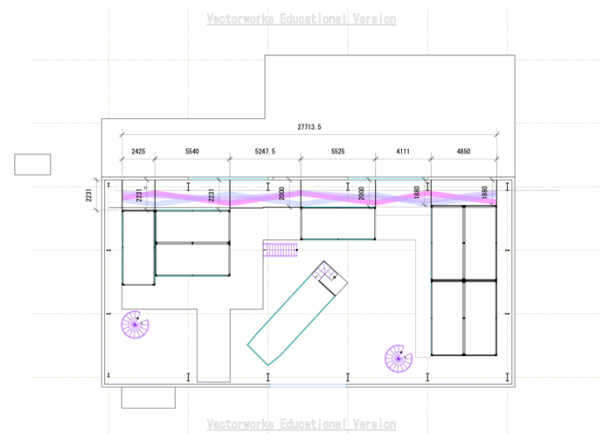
A top view of the installation in the floor plan. Image: Ryura Kawai, and Rika Oosawa.
